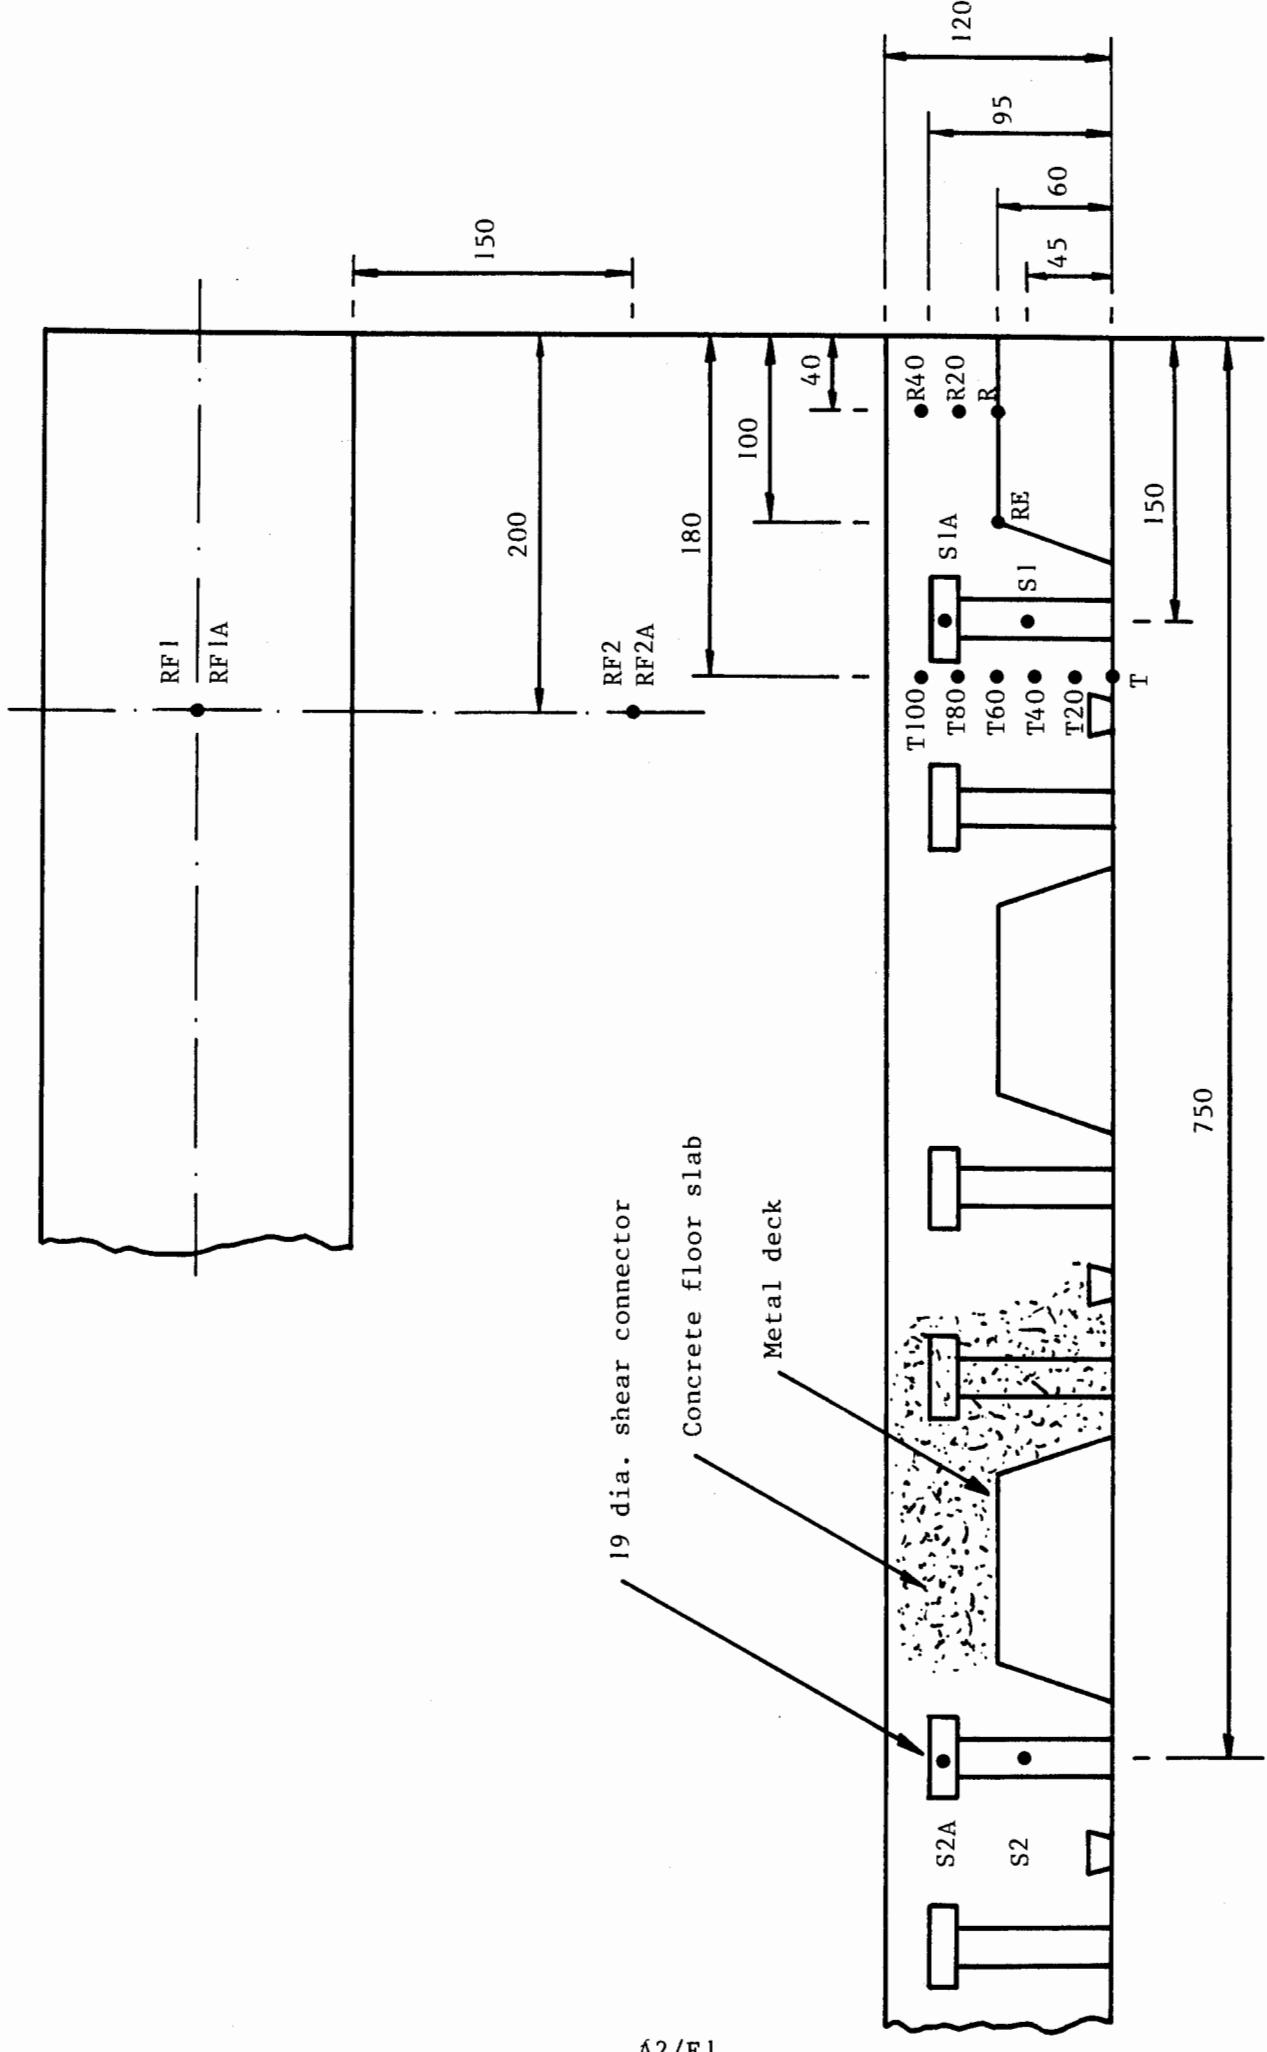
CONCRETE, SHEAR STUD AND REINFORCEMENT THERMOCOUPLE POSITIONS (R4/3668A)
